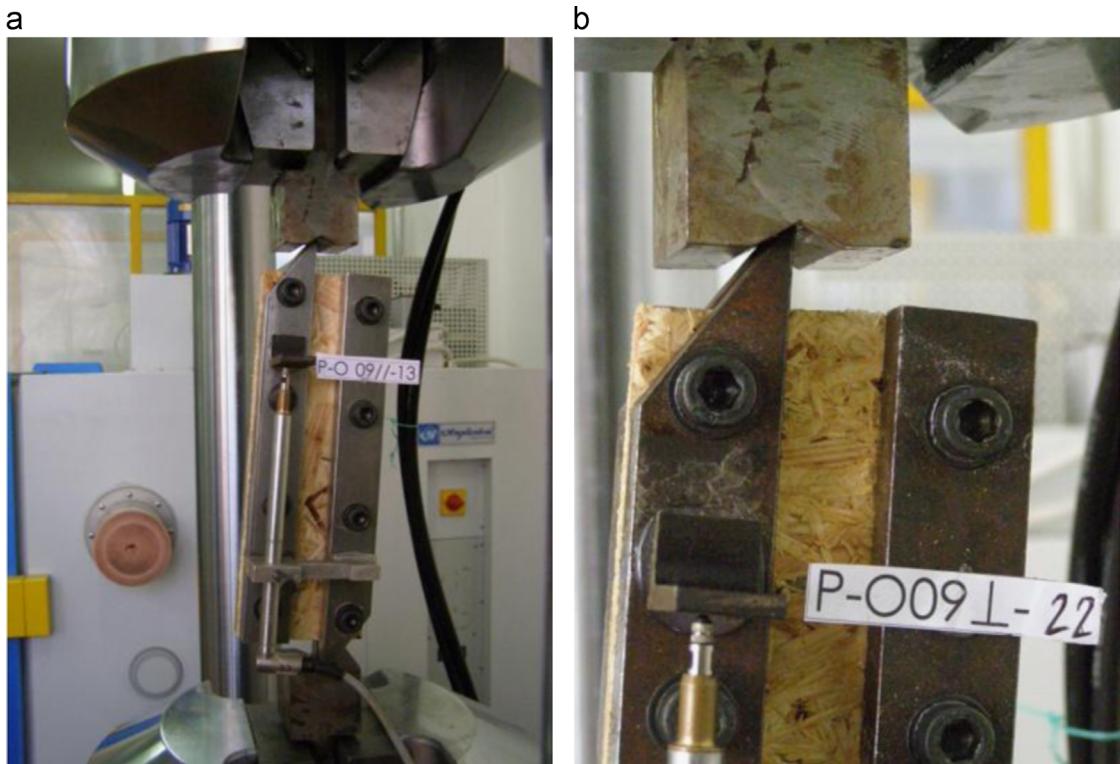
OSB panel test specimen. (a) Set up and (b) failure.
